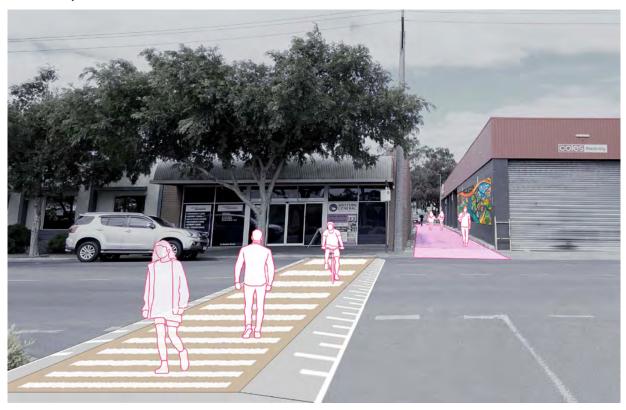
Add a crossing point on Darlot Street to Gleed Street to better connect to both the laneway network and the recreational facilities on the western edge of the CAD.
